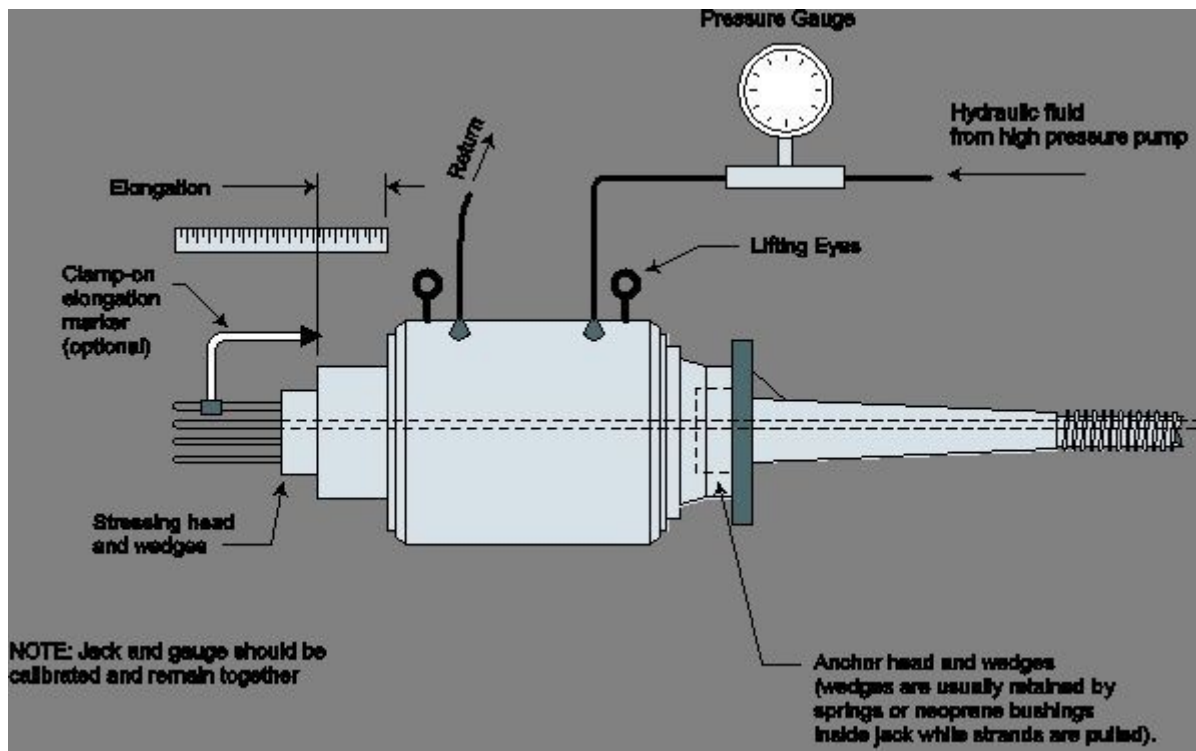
Typical multi-strand, center hole, stressing jack
